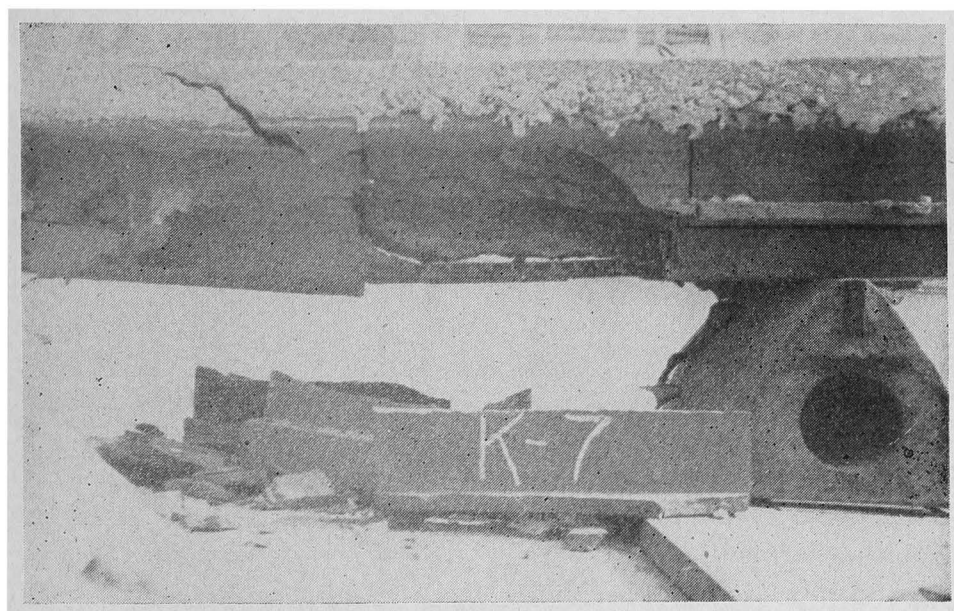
(b). Typical failure of heavy type beams from Tile B.
